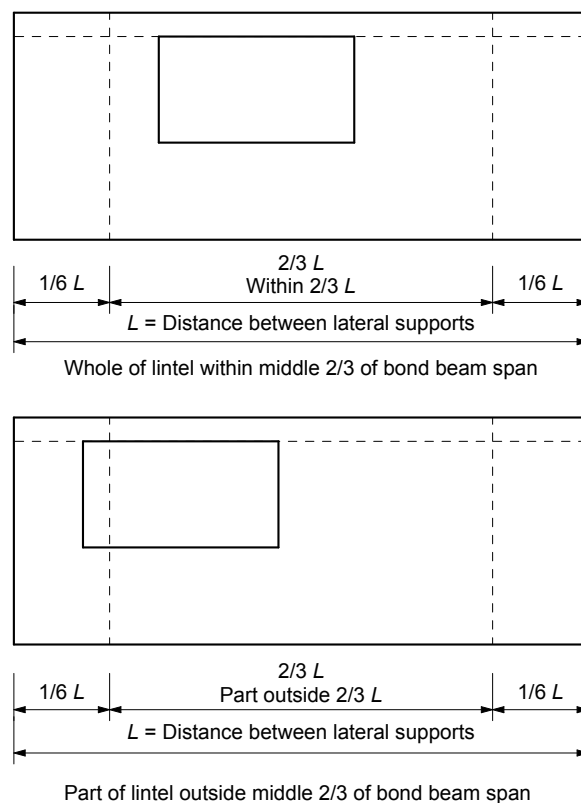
Concrete lintel within and outside middle two-thirds of bond beam span
